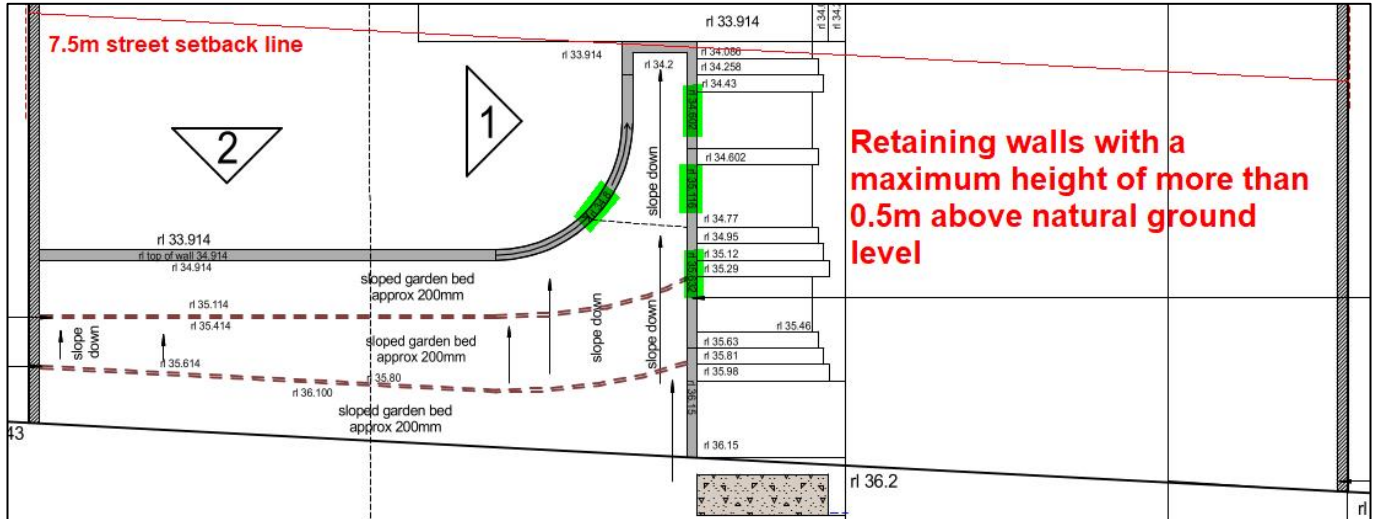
Marked-up site plan showing the portions of the retaining walls that exceed 0.5m above the natural ground level.
